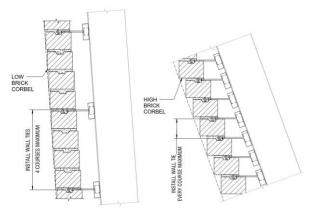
Wall sections showing tie arrangement for a near vertical wall (left) and heavily corbelled wall (right)
